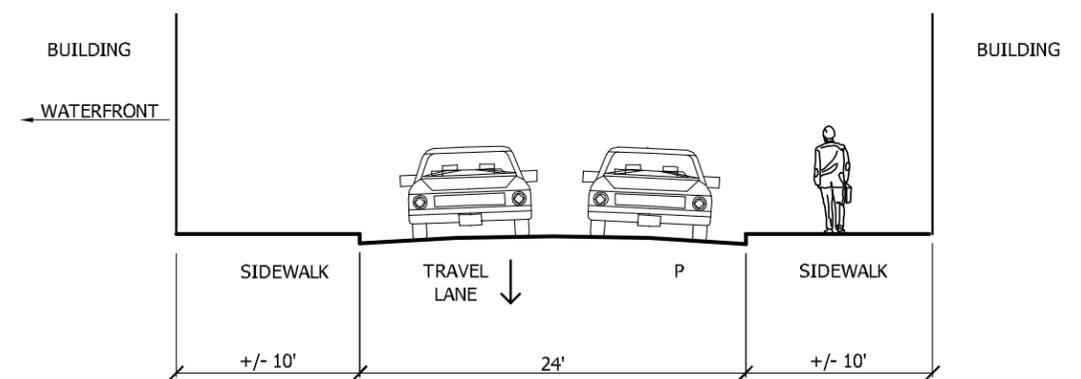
Existing configuration on Water Street looking west from Jay Street
